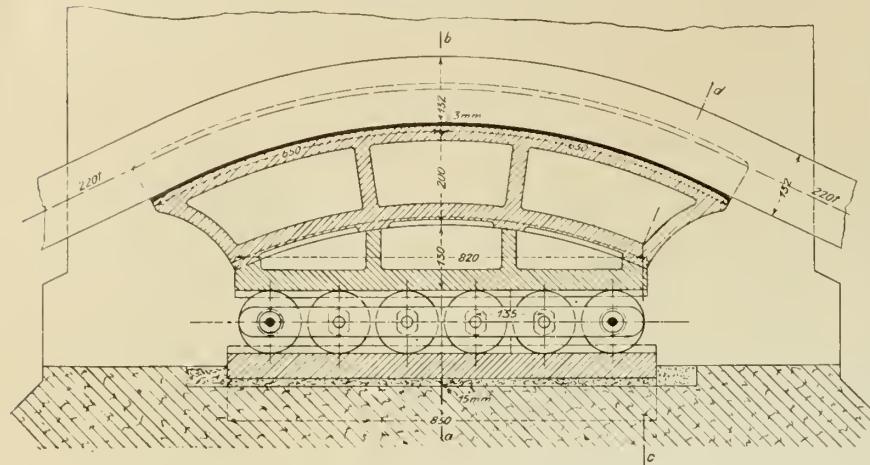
Langenargen Bridge. Anchorage of cable. (Dimensions in millimetres.)
